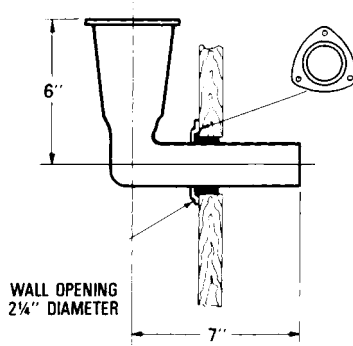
3- by 6-in. Oval Horizontal Wall-Mounted Cup Sink 1 1/2-in. Plain End Outlet
